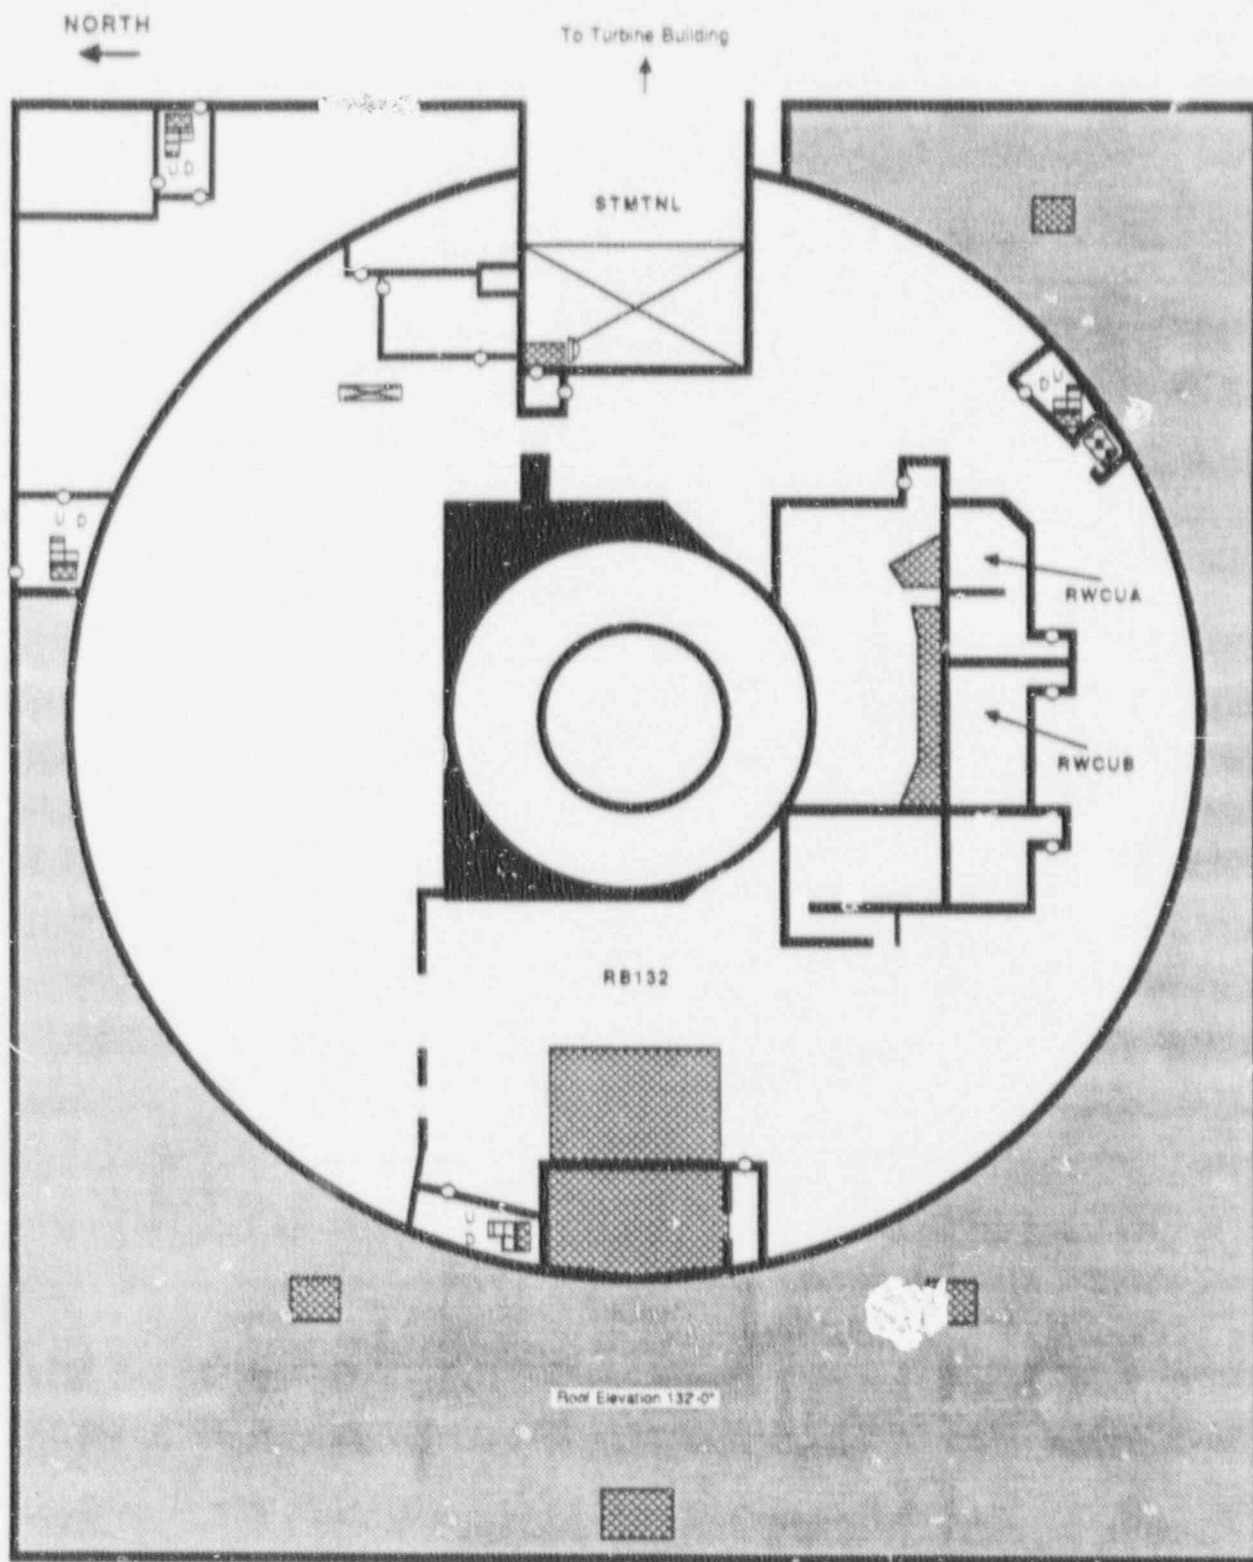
Hope Creek Reactor Building Elevation 132'-0"
